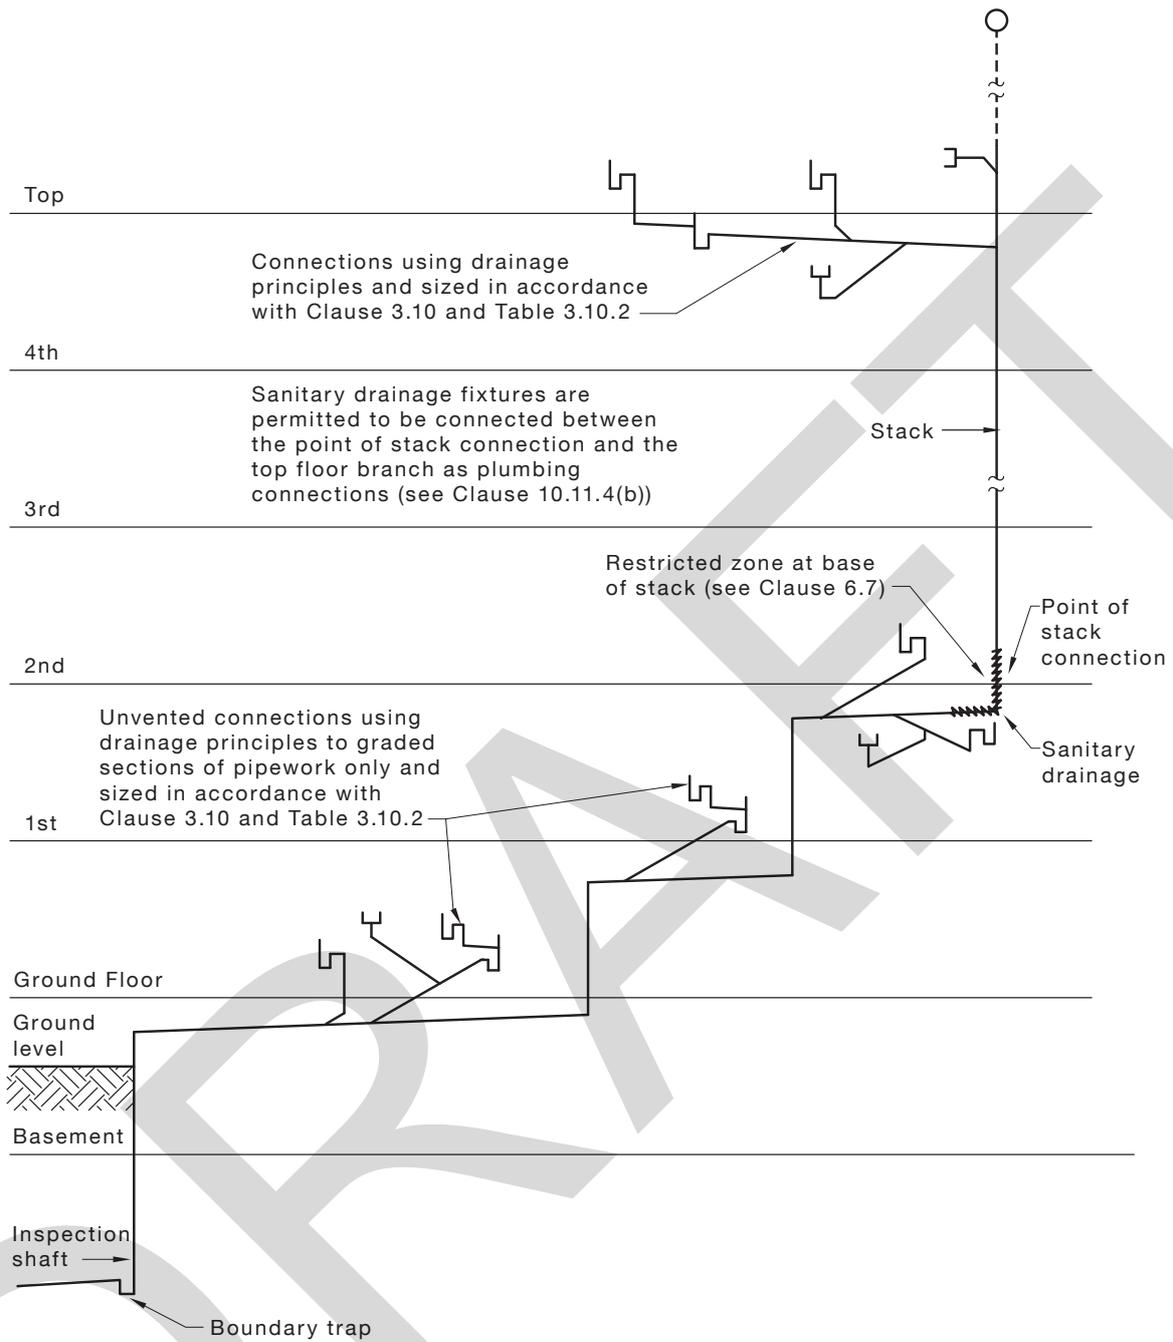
ABOVE-GROUND (ELEVATED) PIPEWORK WITHIN BUILDING—
